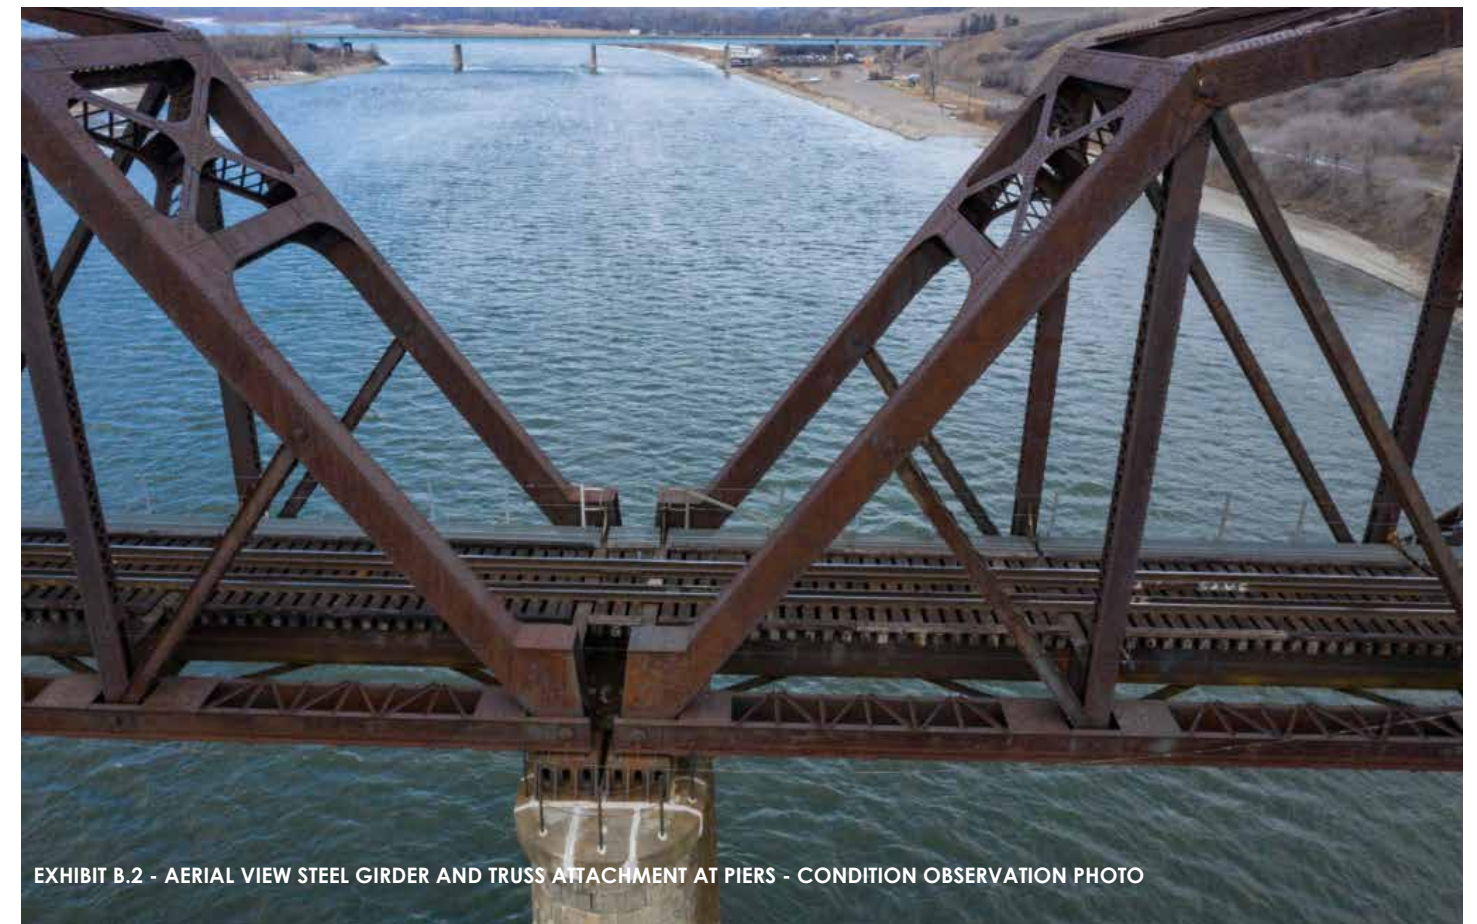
AERIAL VIEW STEEL GIRDER AND TRUSS ATTACHMENT AT PIERS - CONDITION OBSERVATION PHOTO
